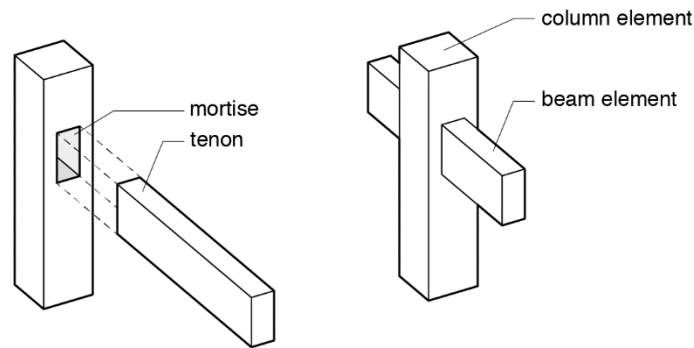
The traditional Japanese Nuki geometry as a mortise-and-tenon-type joinery connection for beams and columns.
